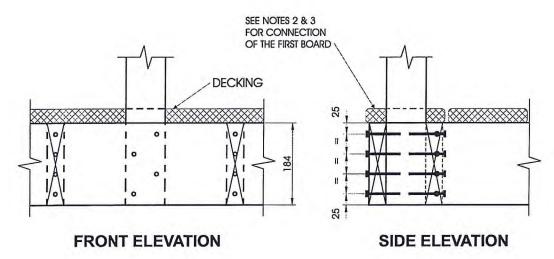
Exterior Connection: Post Nailed to Rim Joist
